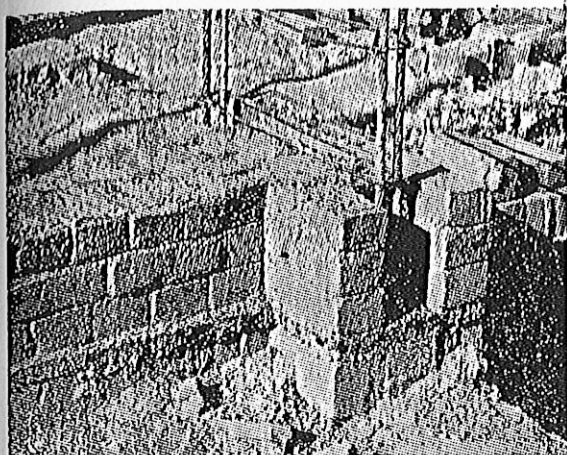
Details of Reinforced Brick Masonry Column under construction.
